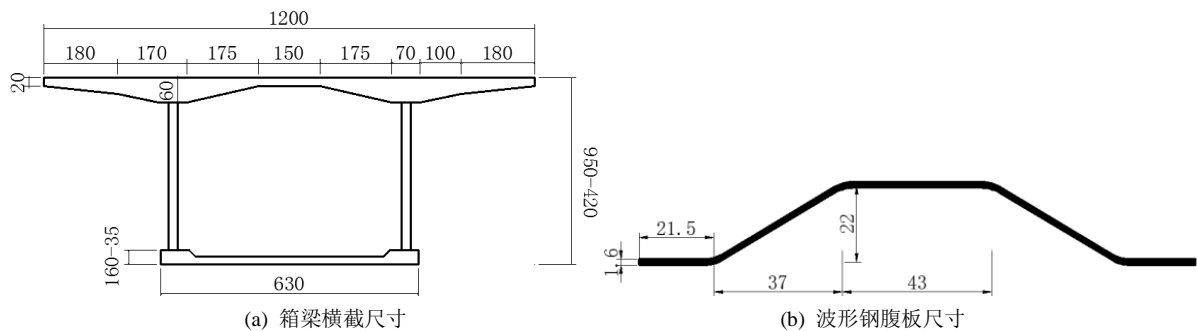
Section diagram of 80 m cantilever variable cross-section corrugated steel web box girder
